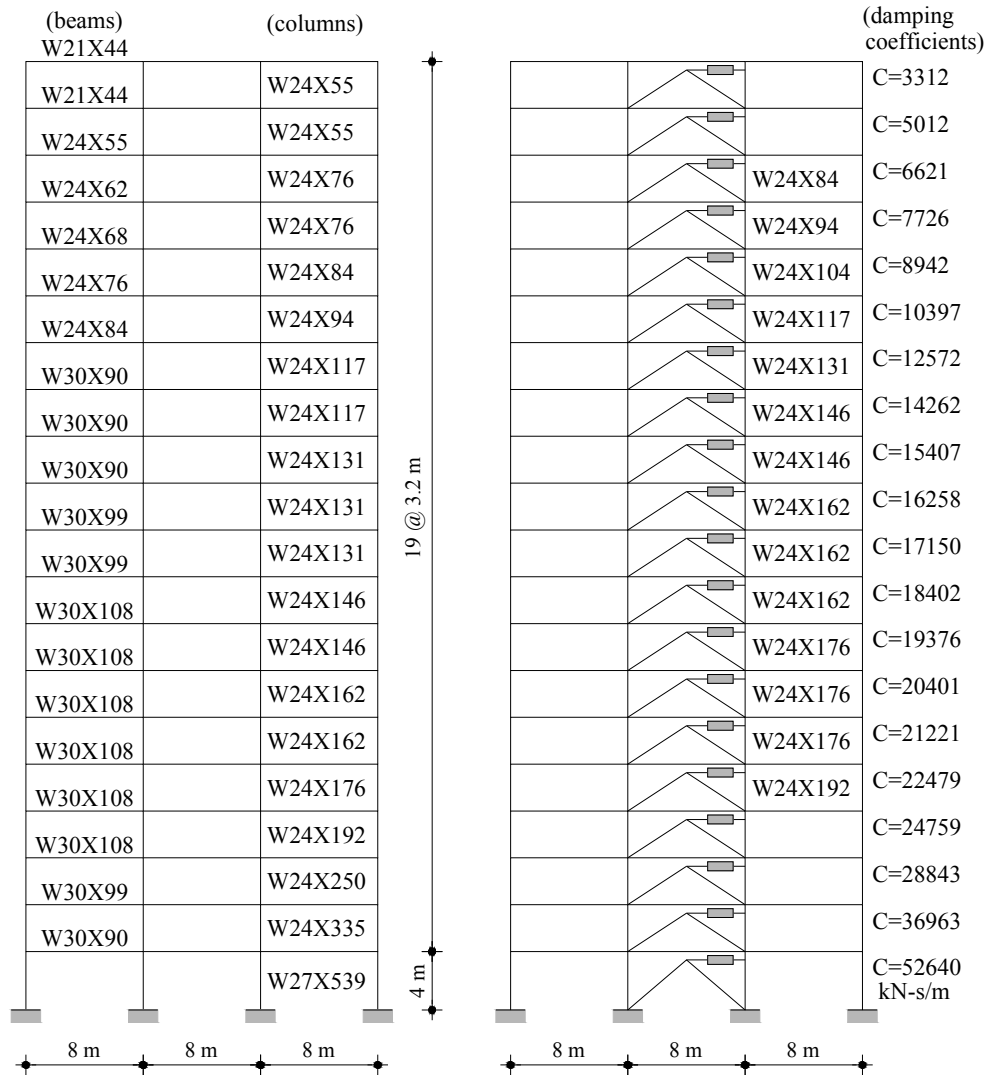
Elevation view and beam/column cross-sections of the 20-storey steel MRFs with and without viscous dampers. The damping coefficients of the viscous dampers are also provided. The beam/column cross-sections of the MRFs with viscous dampers are the same with those of the corresponding MRFs without dampers apart from the indicated interior columns
